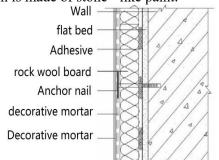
Structural Diagram of Rock Wool Board Thin - Plaster Exterior Wall External Insulation System.
